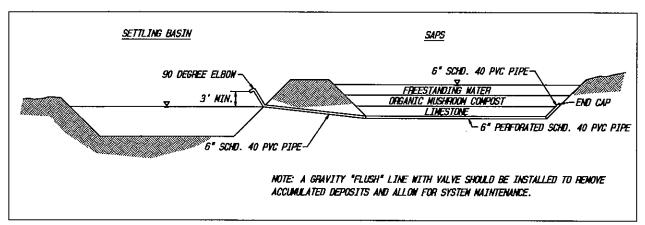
TYPICAL PROFILE OF SAPS OUTLET USING PIPE TO CONTROL WATER ELEVATION
